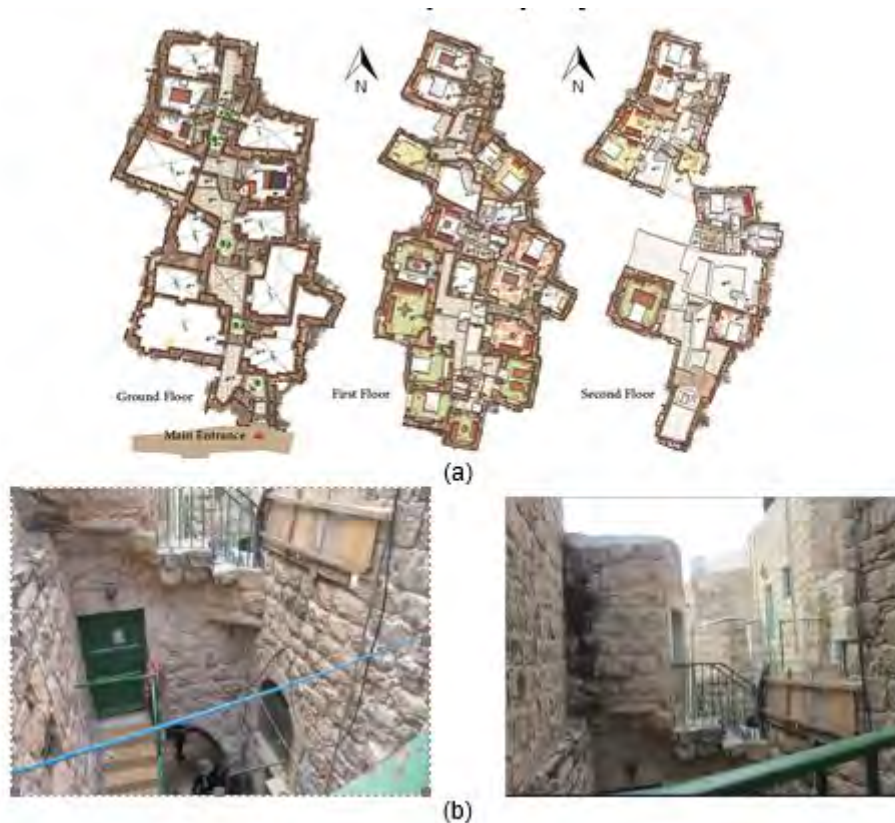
(a) Collective Houses overlooking the Common Yard (b) Yard shots
